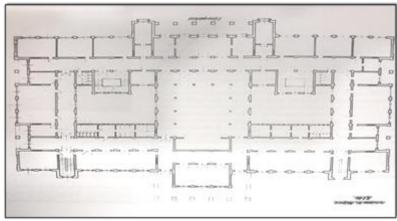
Gazi Education Institute, First Floor Plan, (Yavuz, Y, Empire to Republic Architect Kemalettin 1870-1927, Source: GEEA)
